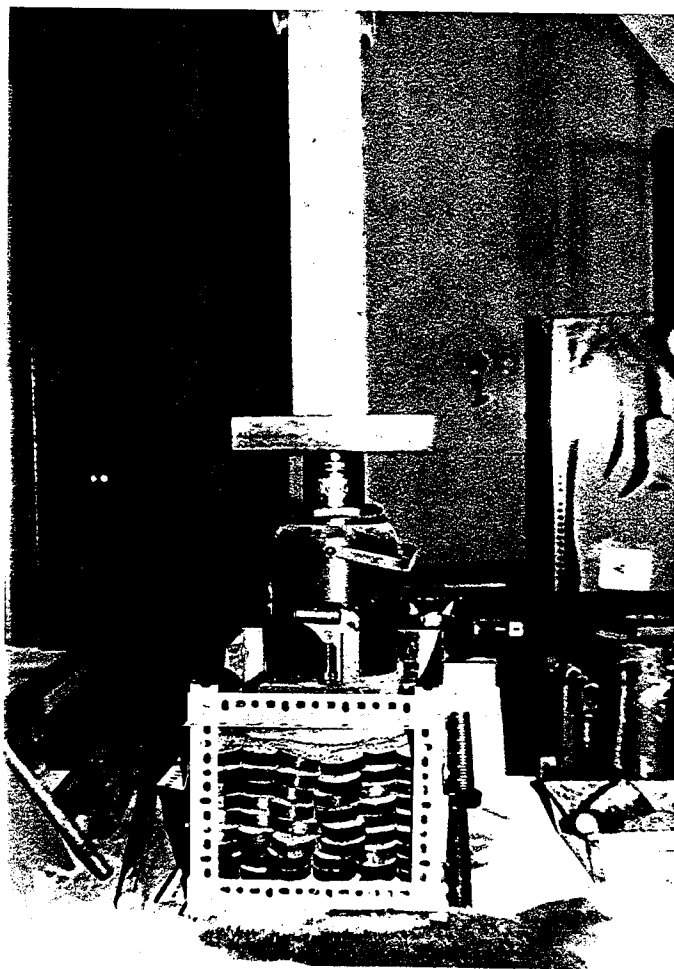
Loading Frame with a Model Tyre Retaining Wall
